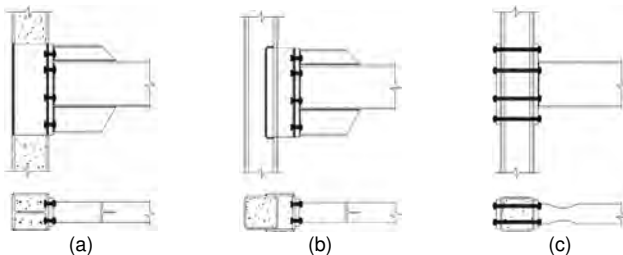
Bolted beam-to-column joints (Hoang et al., 2014)
